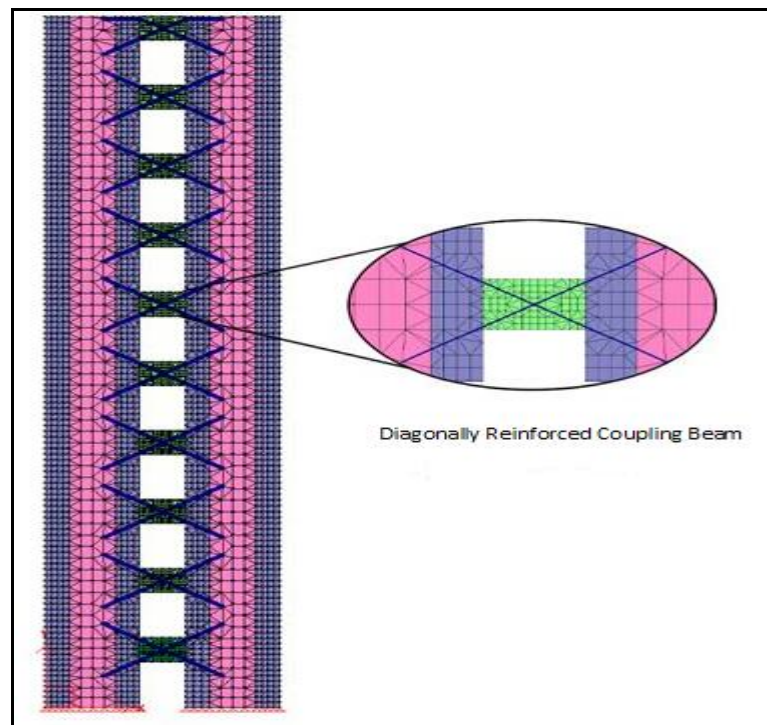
Stiffened Coupled Shear wall with Details of a Beam (URL12)
